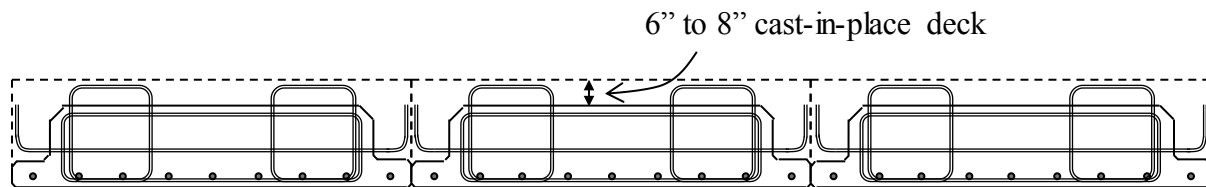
Typical FSB section with 6 to 8-inch CIP composite deck
